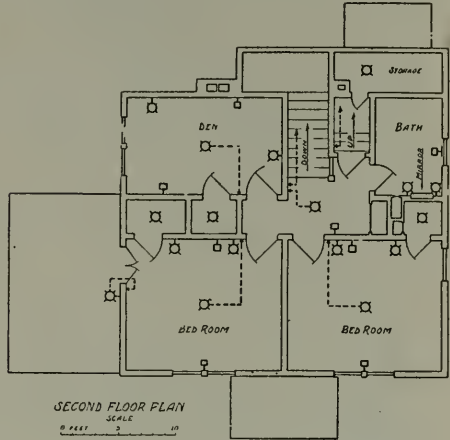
ADEQUATE WIRING FOR THE SECOND FLOOR
